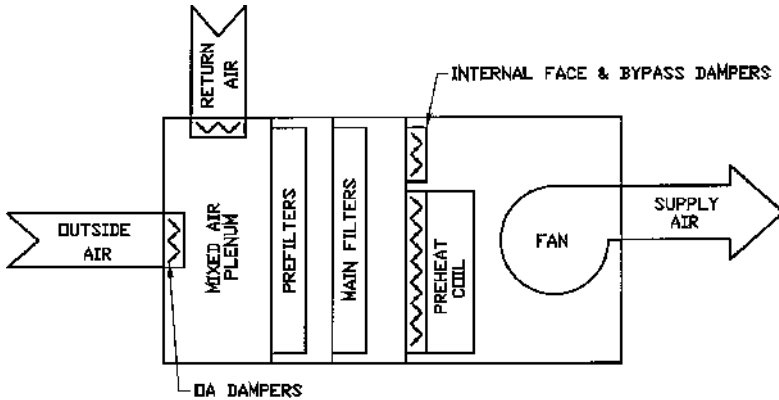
AIR HANDLING UNITS W/INTERNAL FACE AND BYPASS DAMPERS (PREHEAT COIL FREEZE PROTECTION).
